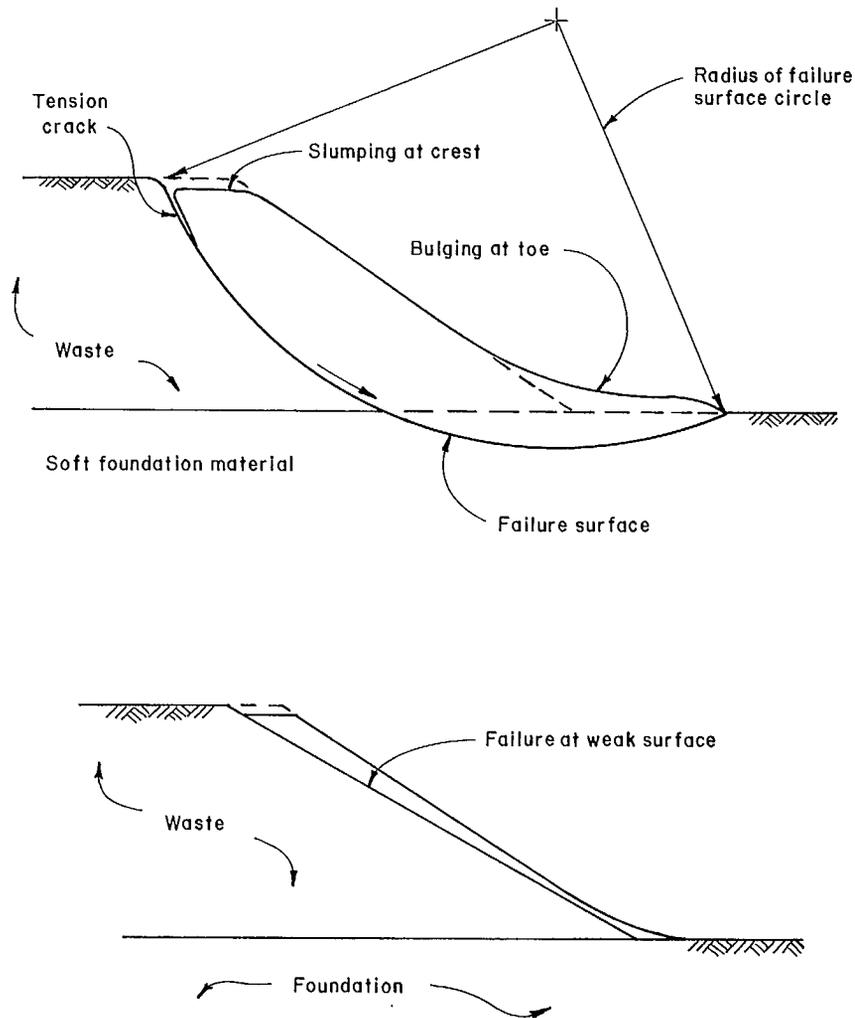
Typical instability modes. Top: rotational sliding. Bottom: plane shear.
